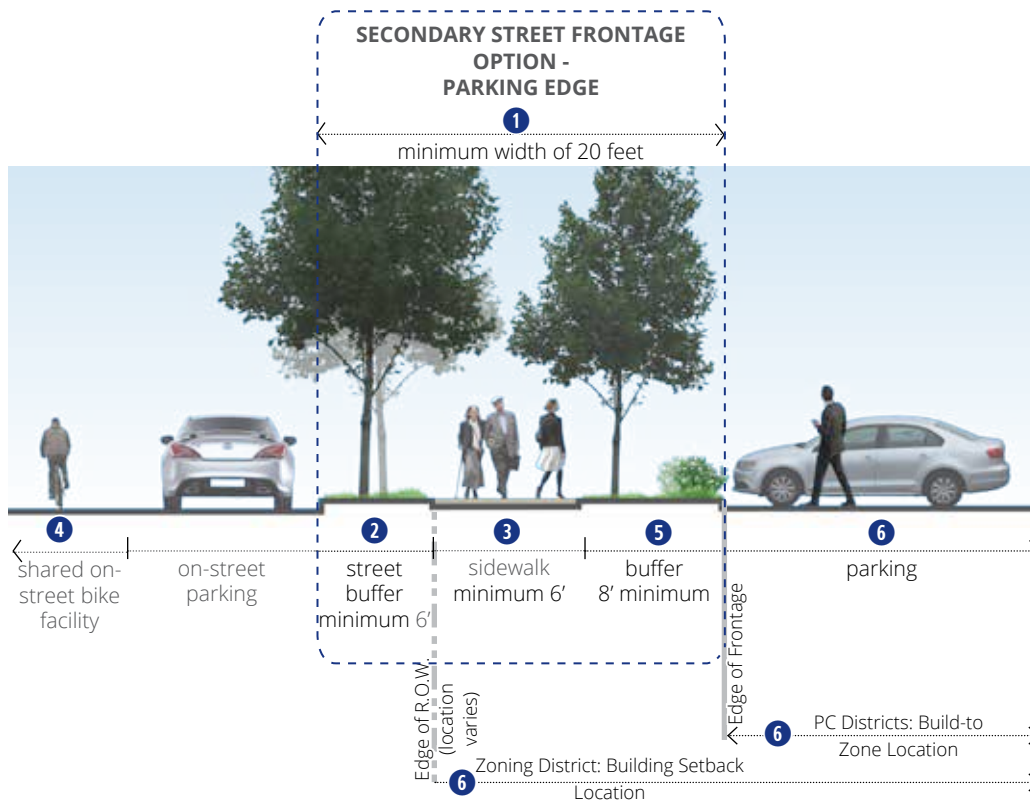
Secondary Street Frontage Option - Parking Edge
